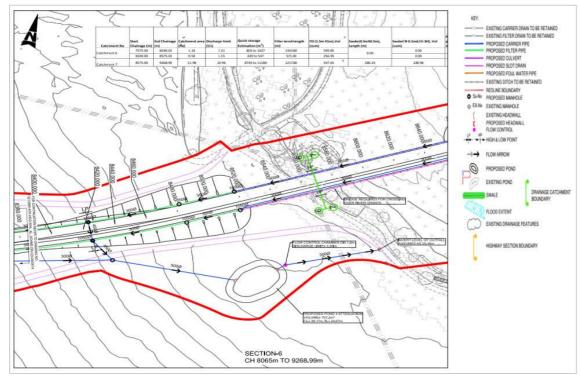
Proposed Pond 4 – layout and discharge location
